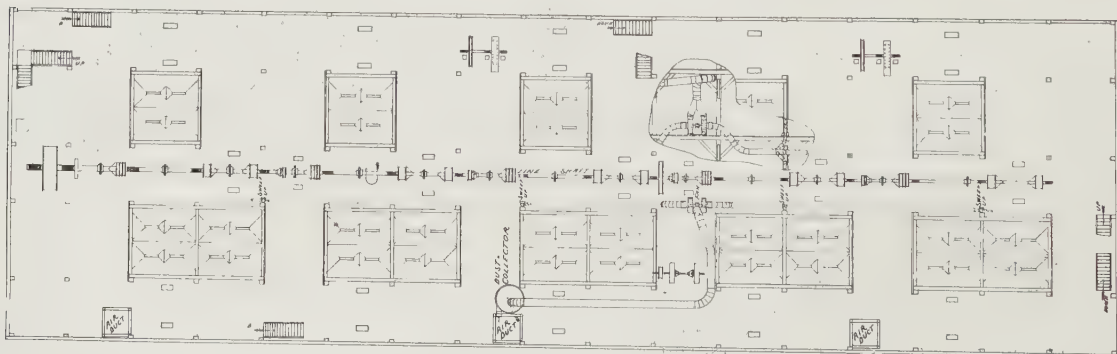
Plan of Garner Floor Showing Sweeper System.
